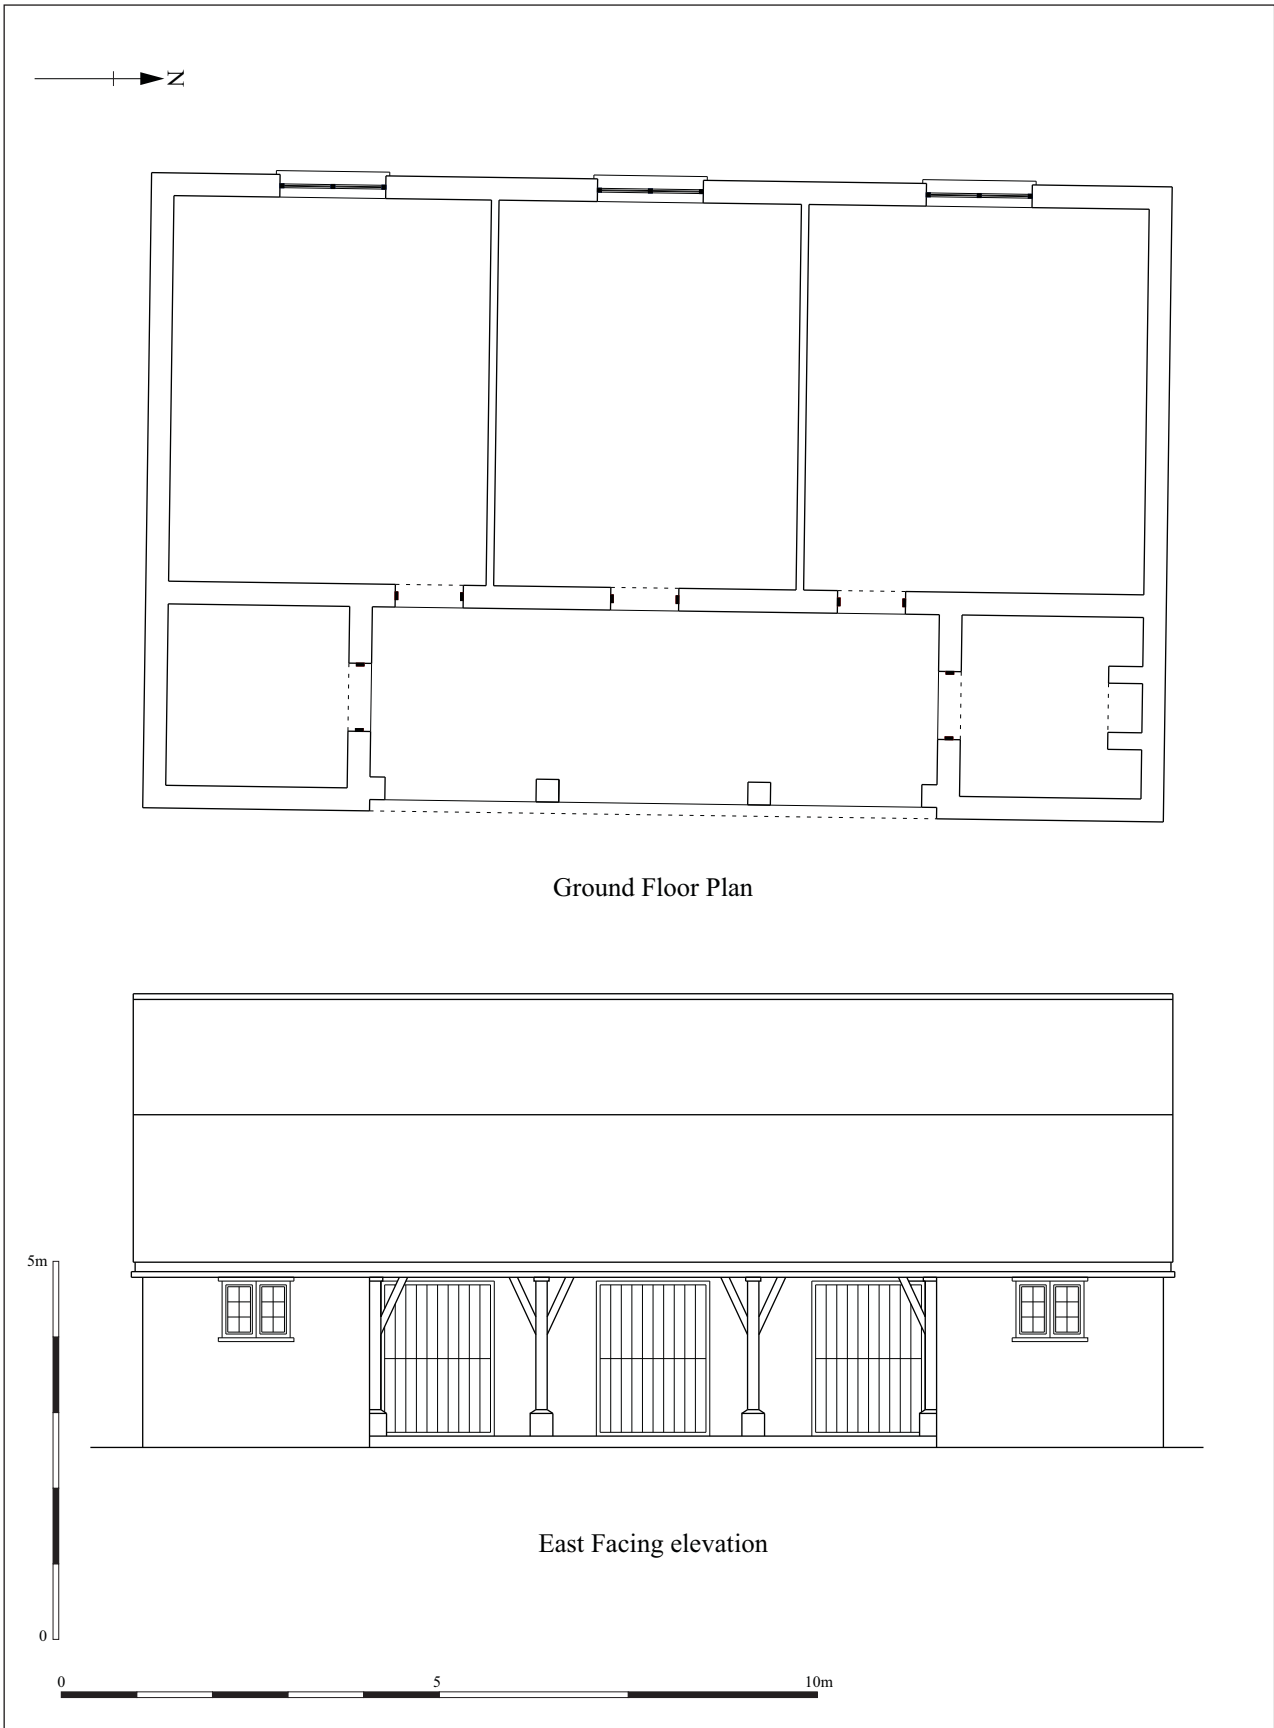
Floor plan and east facing elevation of the stables (from data supplied by Lowden Construction)
